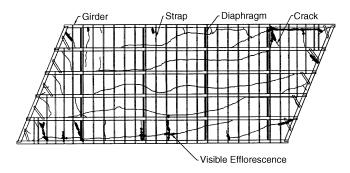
Cracks on the underside of the ArchDeck slab of the Salmon River Bridge.
